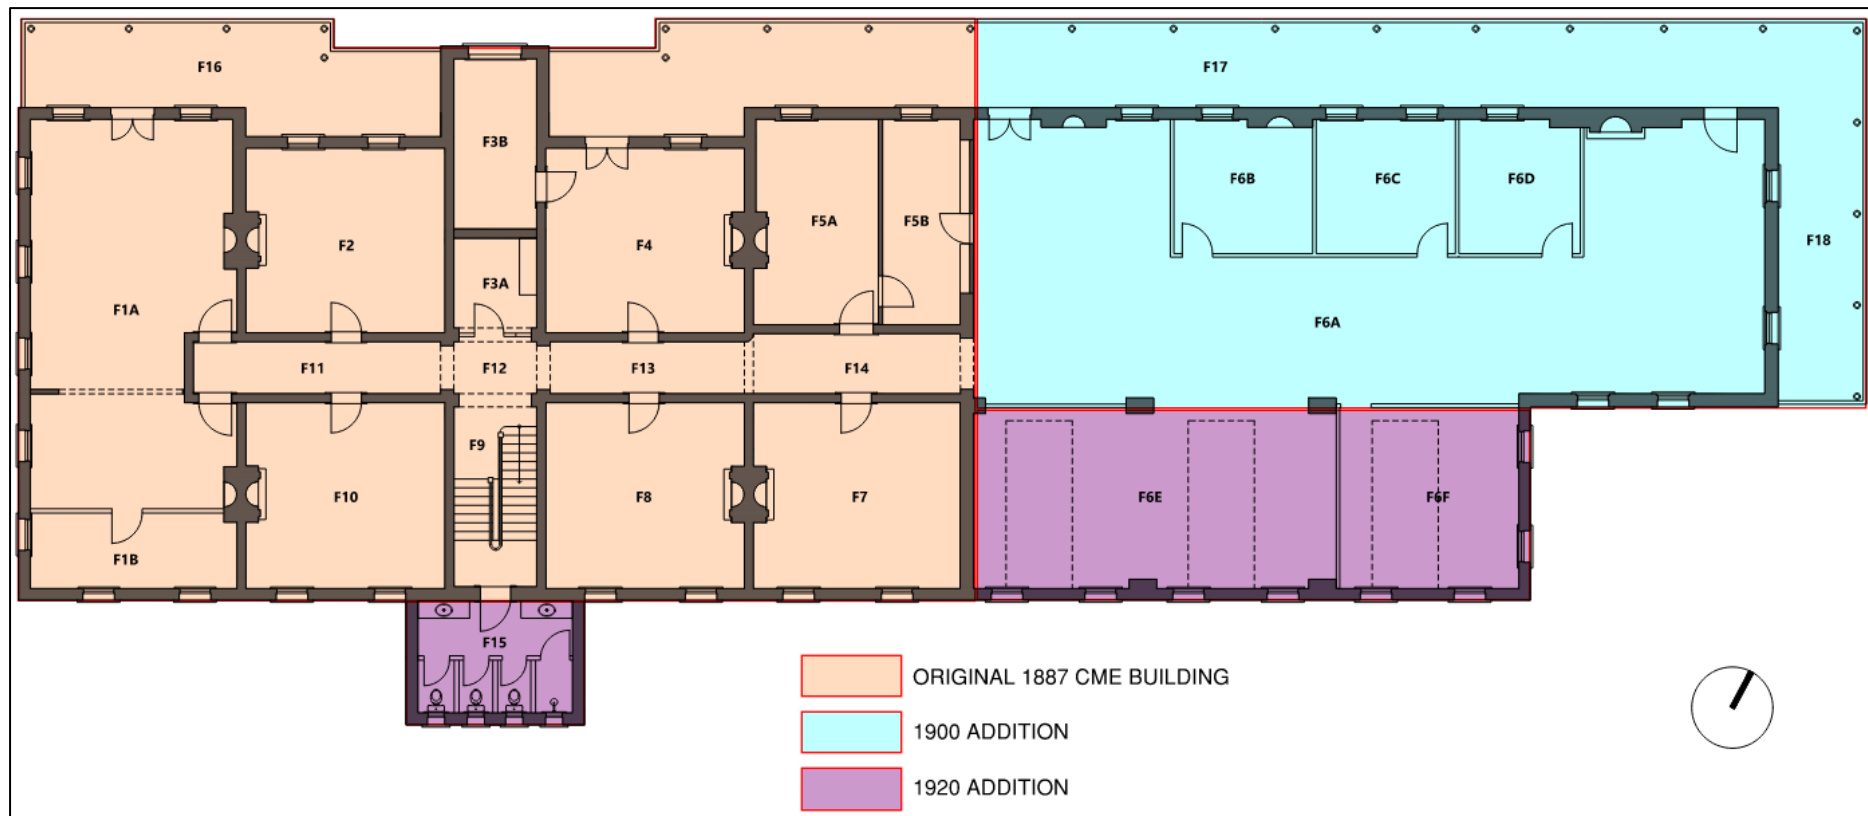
First Floor Layout showing Construction stages (Source: Curio Projects 2022)
